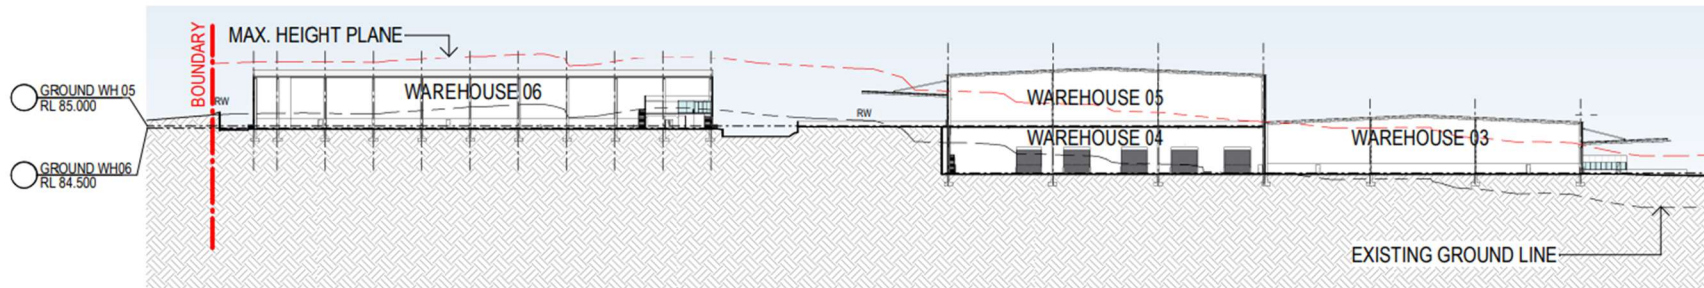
Approved SSD 10399 elevation (Source: SBA)
